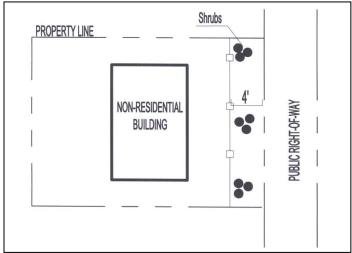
(C): Fences/Walls Abutting Public Rights-of-Way
